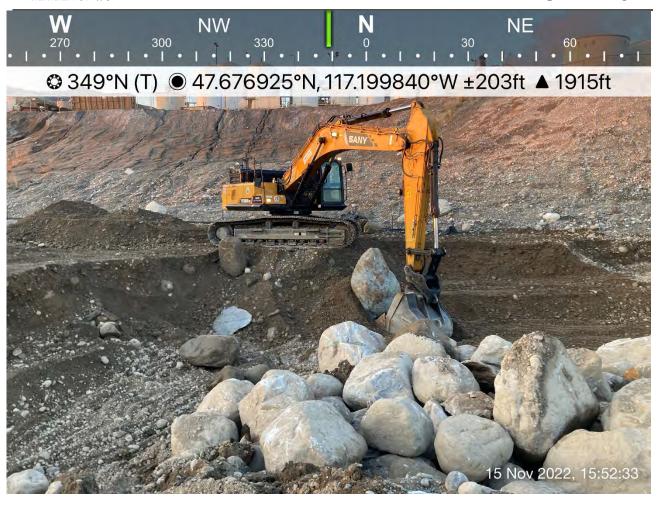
Large boulders continue to be encountered in Excvation #8 & #9. The boulders are rolled and moved to the center of the excavation as shown in the photograph.
